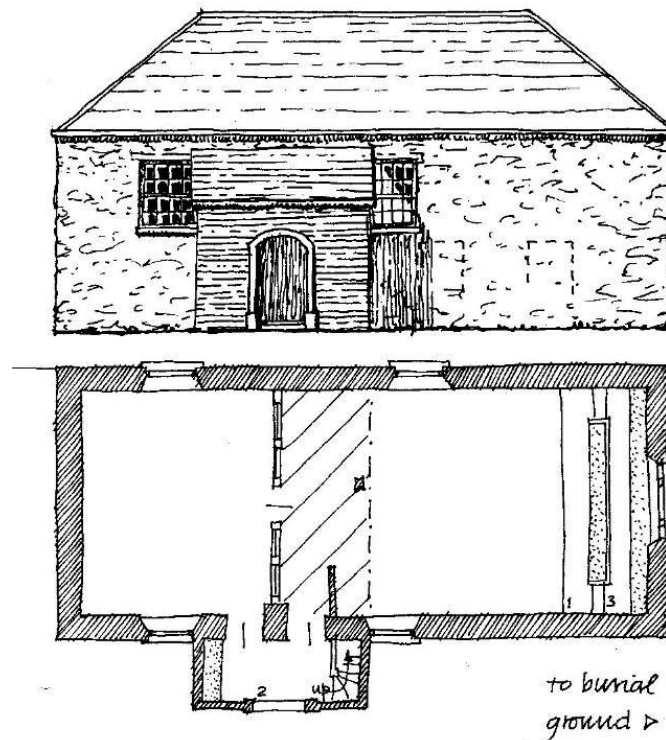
West elevation and plan of the meeting house, *Butler* 1999 vol.2 p.742, (north is to the left).
